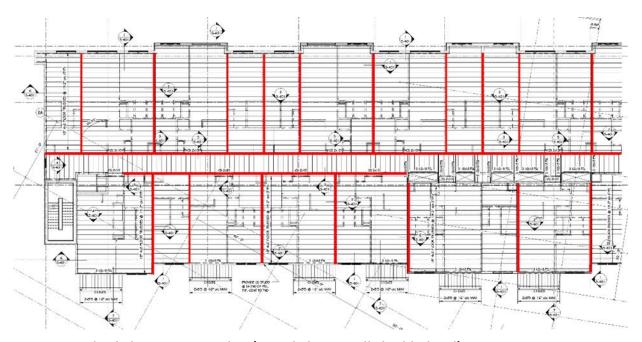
Third Floor Framing Plan (Wood Shear Walls highlighted)
